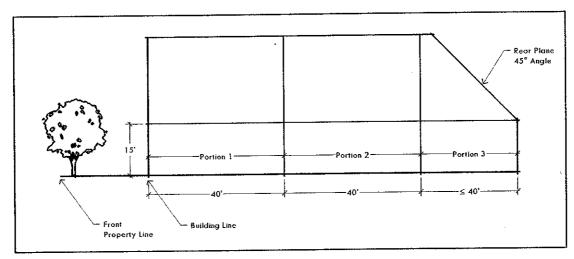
(Elevation View) Rear Setback Plane (Level Ground)
